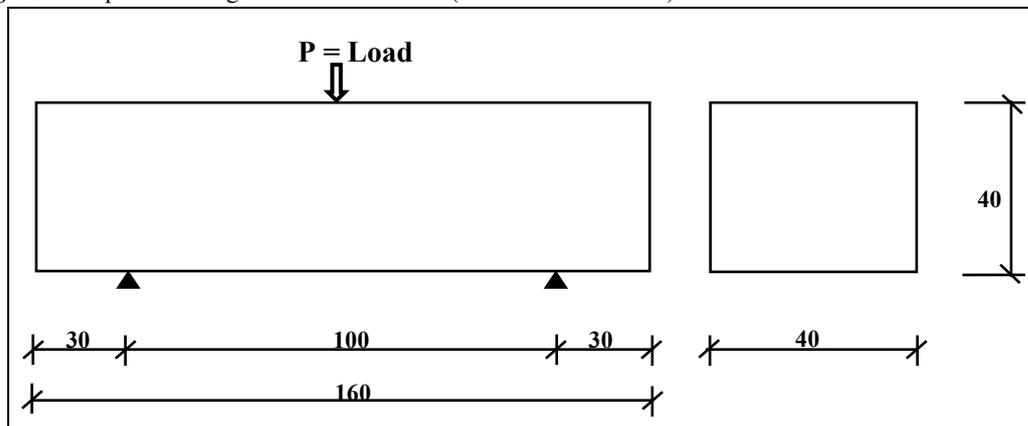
Loading arrangement for modulus of rupture experiment (all dimensions in mm)
